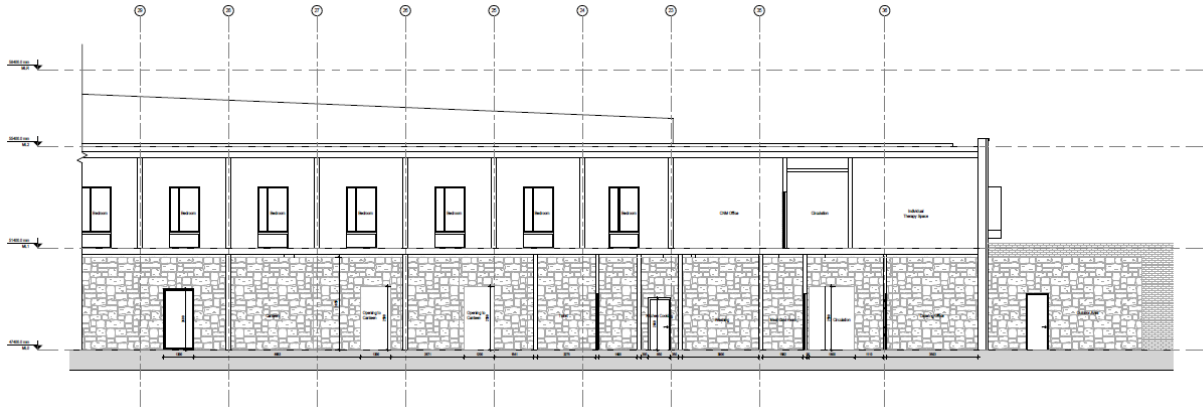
Proposed east elevation, Part 2. Source: TOT Architects
